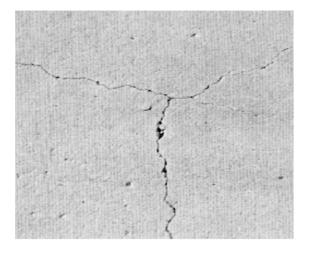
Drying shrinkage cracks due to improper joint spacing (ACI 302.1-R04,www.portcement.org)
